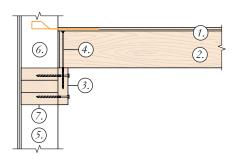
NLT Support at Balloon-Framed Wood Shear Wall
